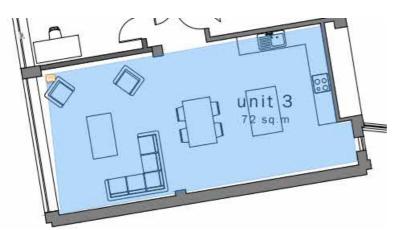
Unit 3 living kitchen dining room - Extract from floor plan - drawing number 1600529.2. drawn by AC at Marrons
